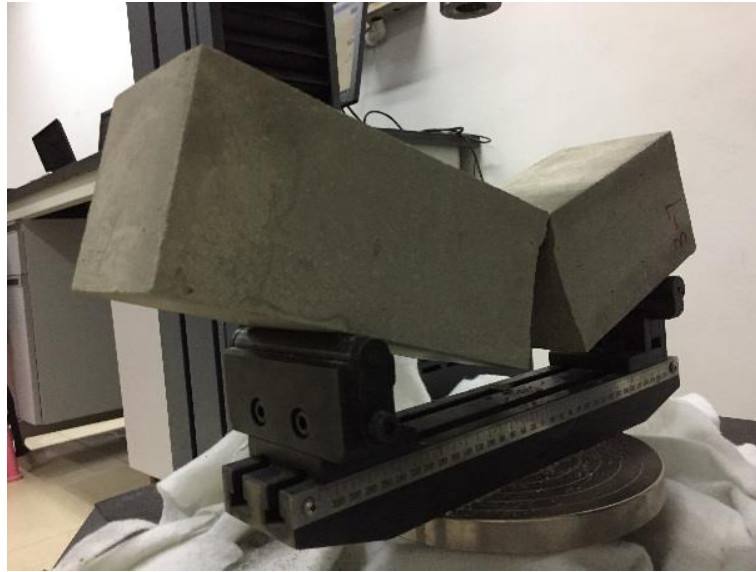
Damaged prismatic specimen in four-point bending tests.
